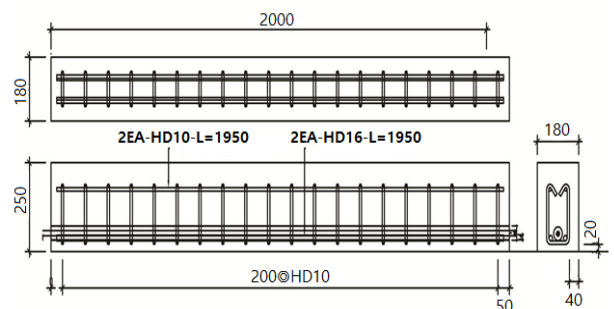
Beam specimen (arrangement of reinforcing steel)
